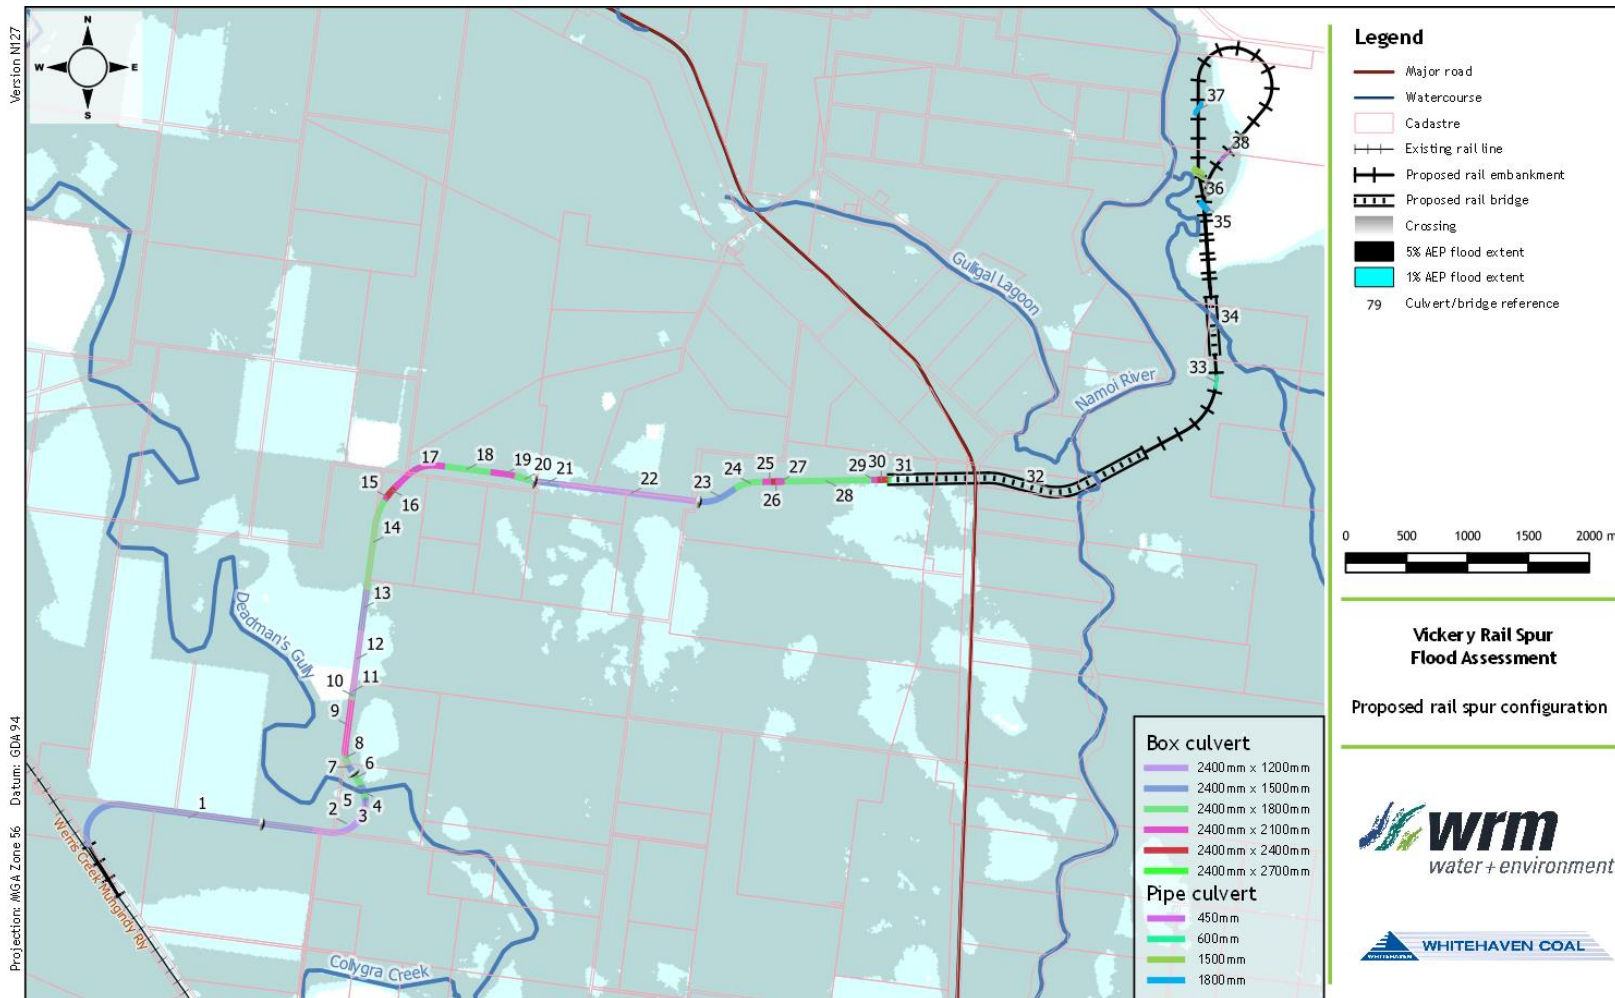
Proposed Project rail spur alignment and culvert and bridge section locations
